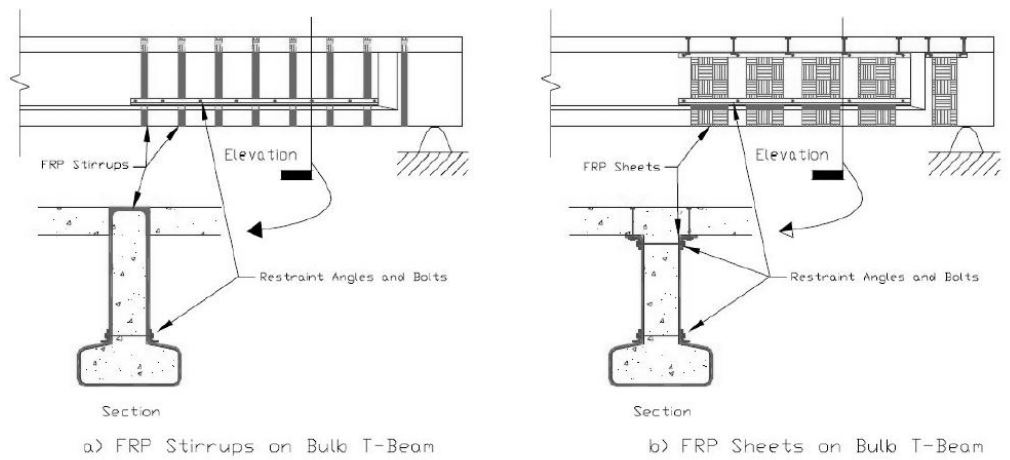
Typical Shear Strengthening of AASHTO-Type Girder Bridge
